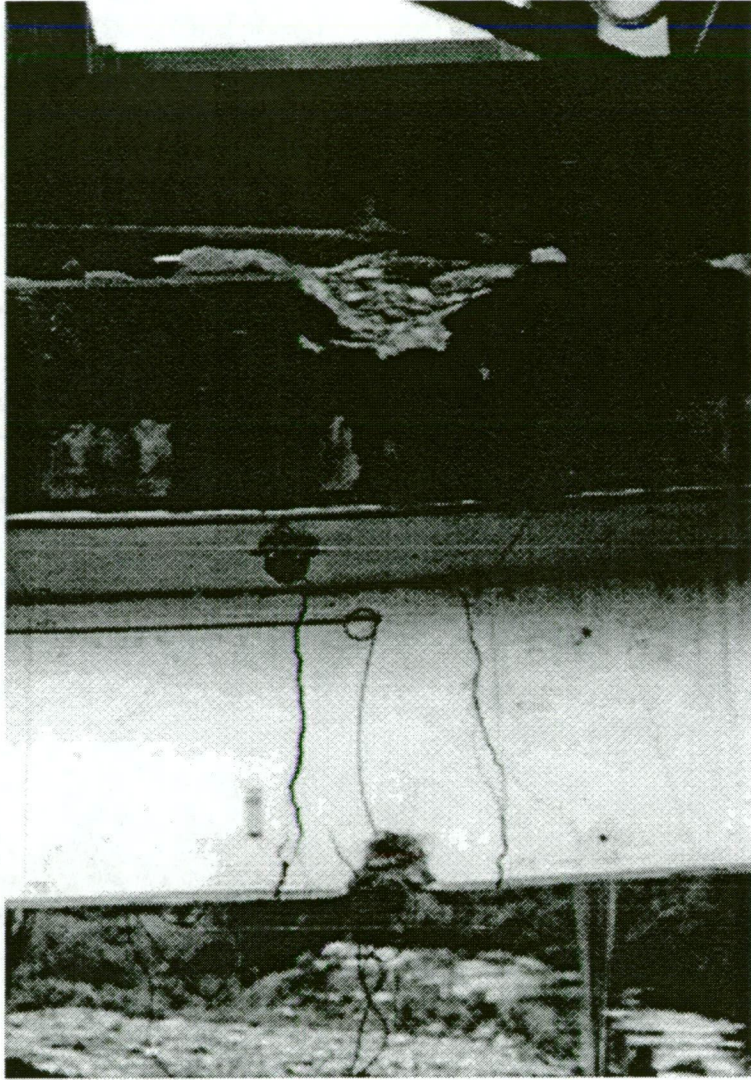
Cracking of Downstream Beam and Crushing of Deck at Ultimate Load
